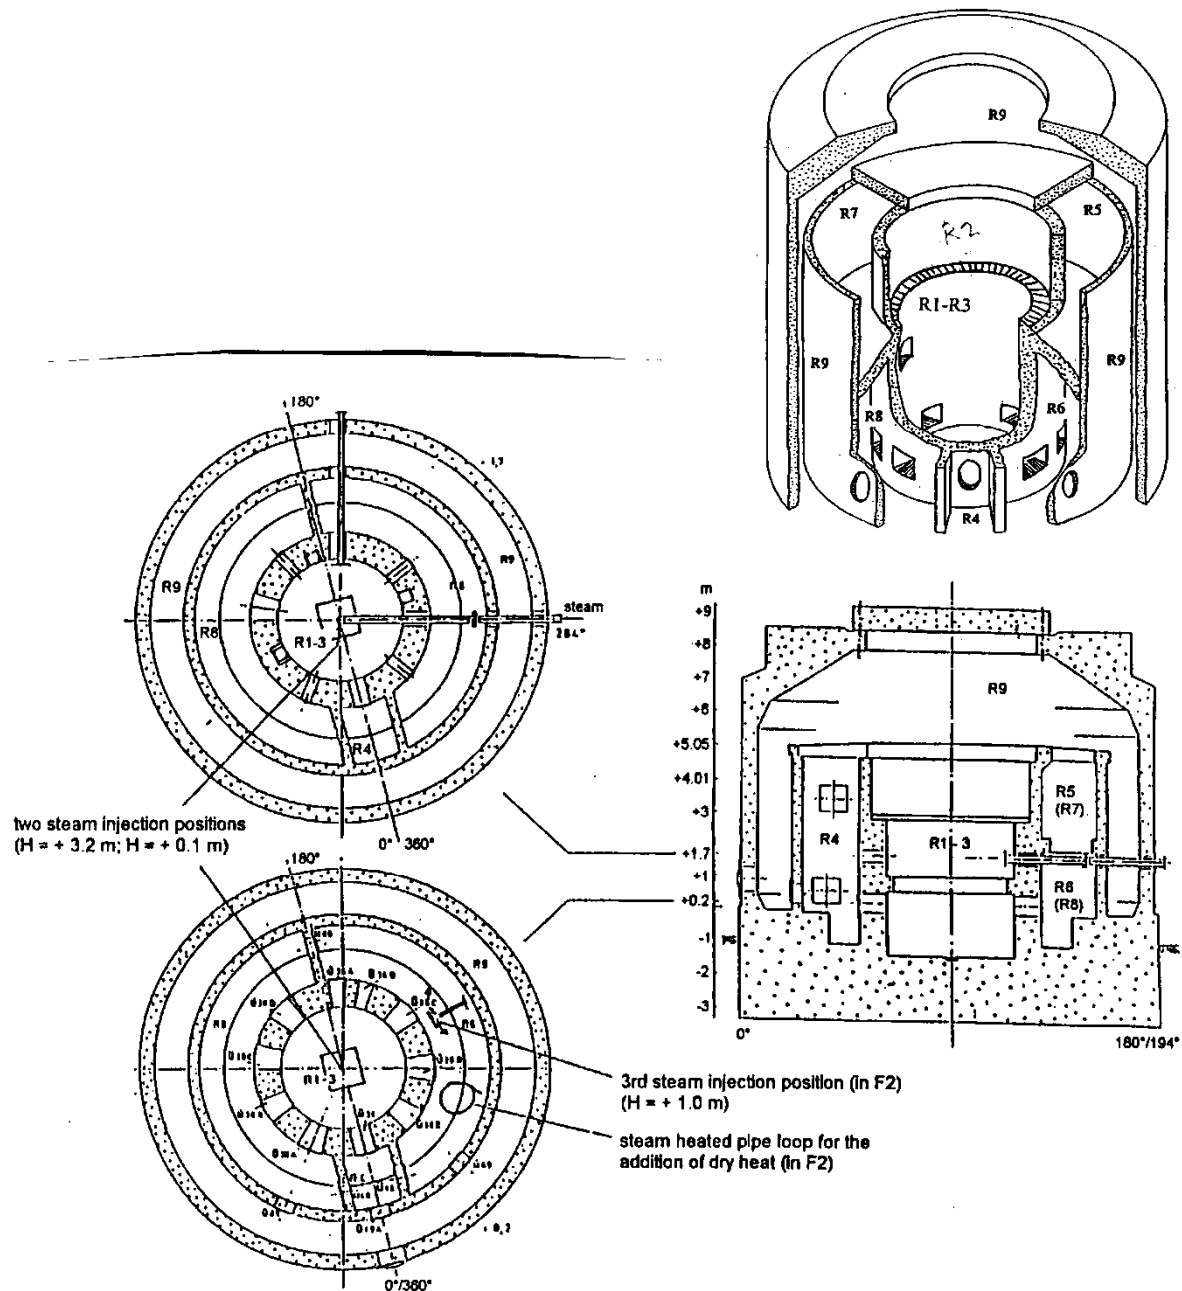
C-25. Model Containment: Vertical Cross-section 0/180; Horizontal Cross-sections at +0.2 m and +1.7m for Configuration in Experiment F2
